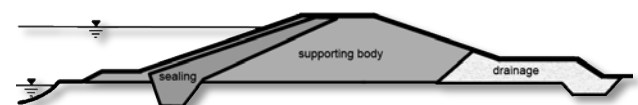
Example cross-section of a German river dike section with three zones (sealing, supporting body, drainage)
